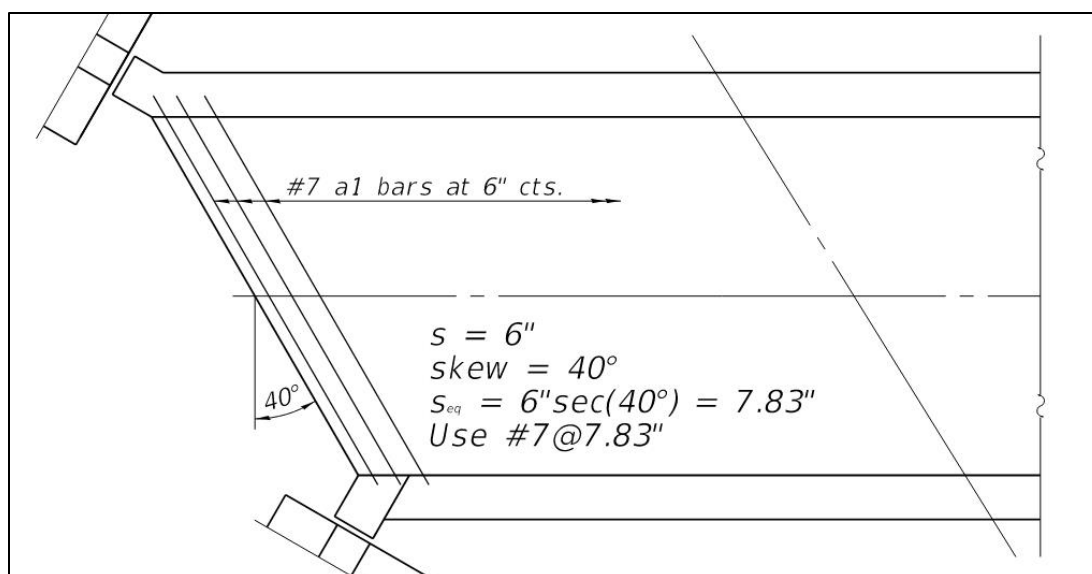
Spacing detailed parallel to the sidewalls
